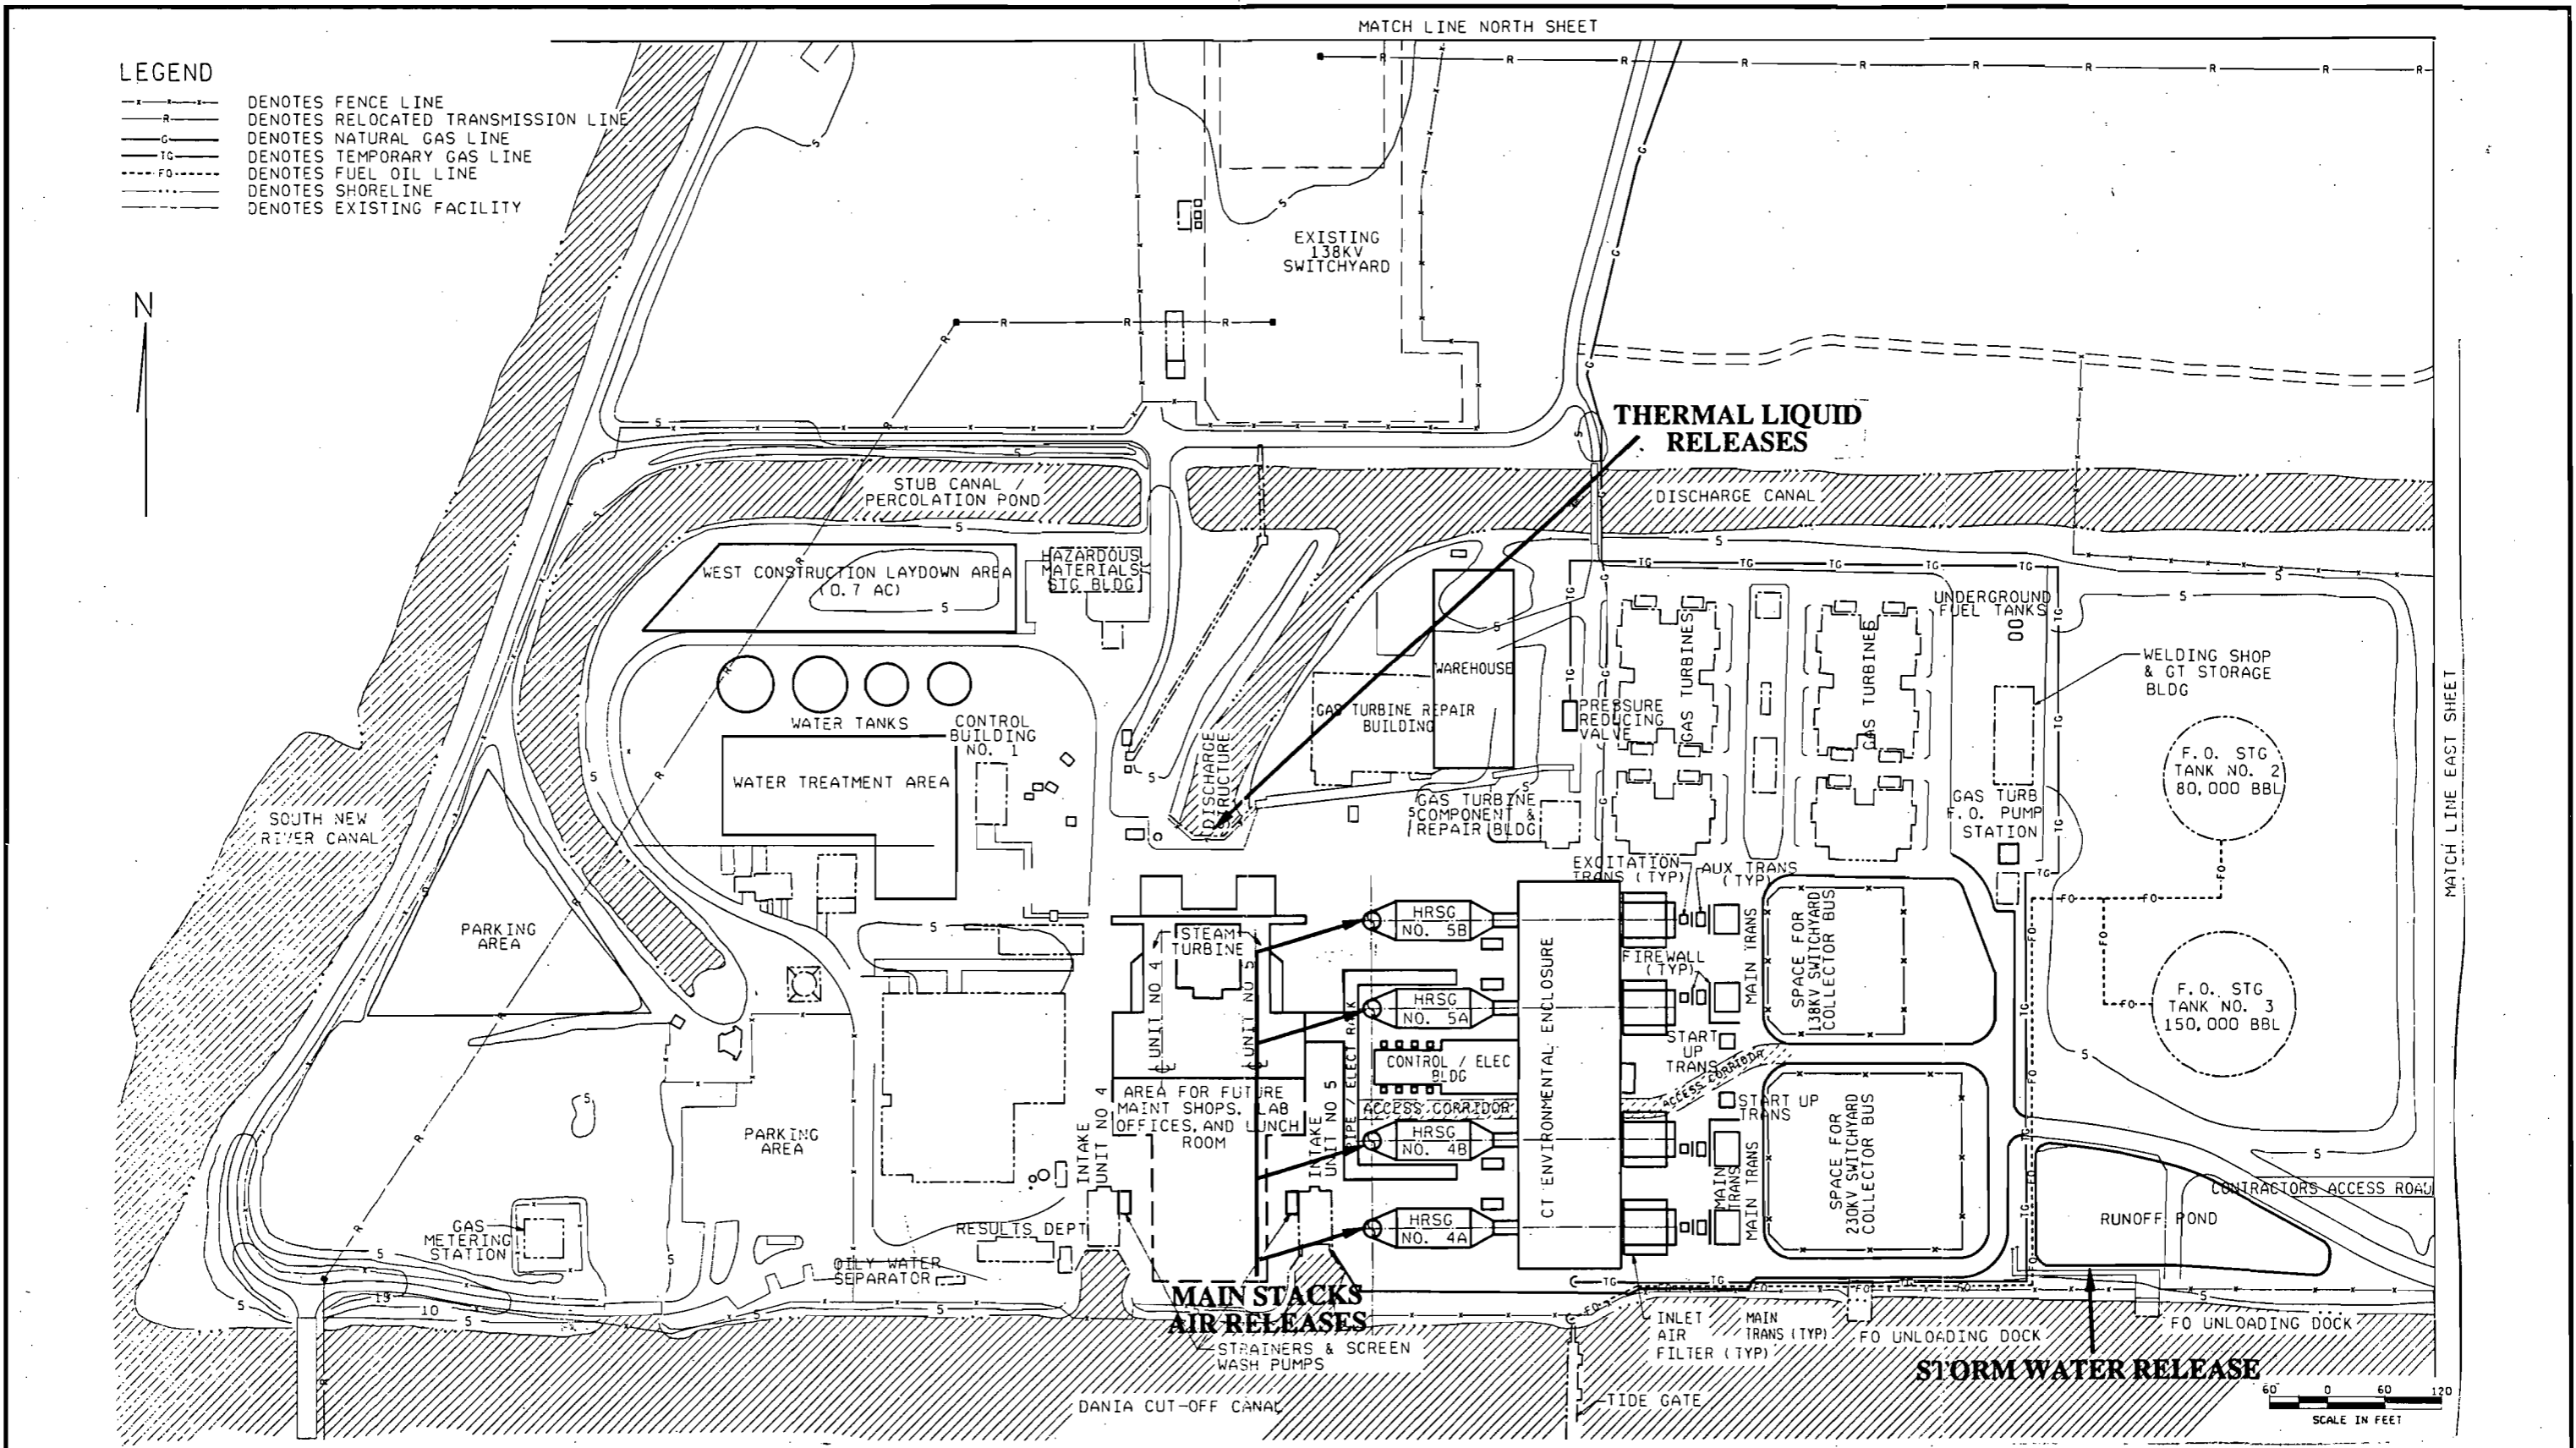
SITE LAYOUT POWER BLOCK AREA
